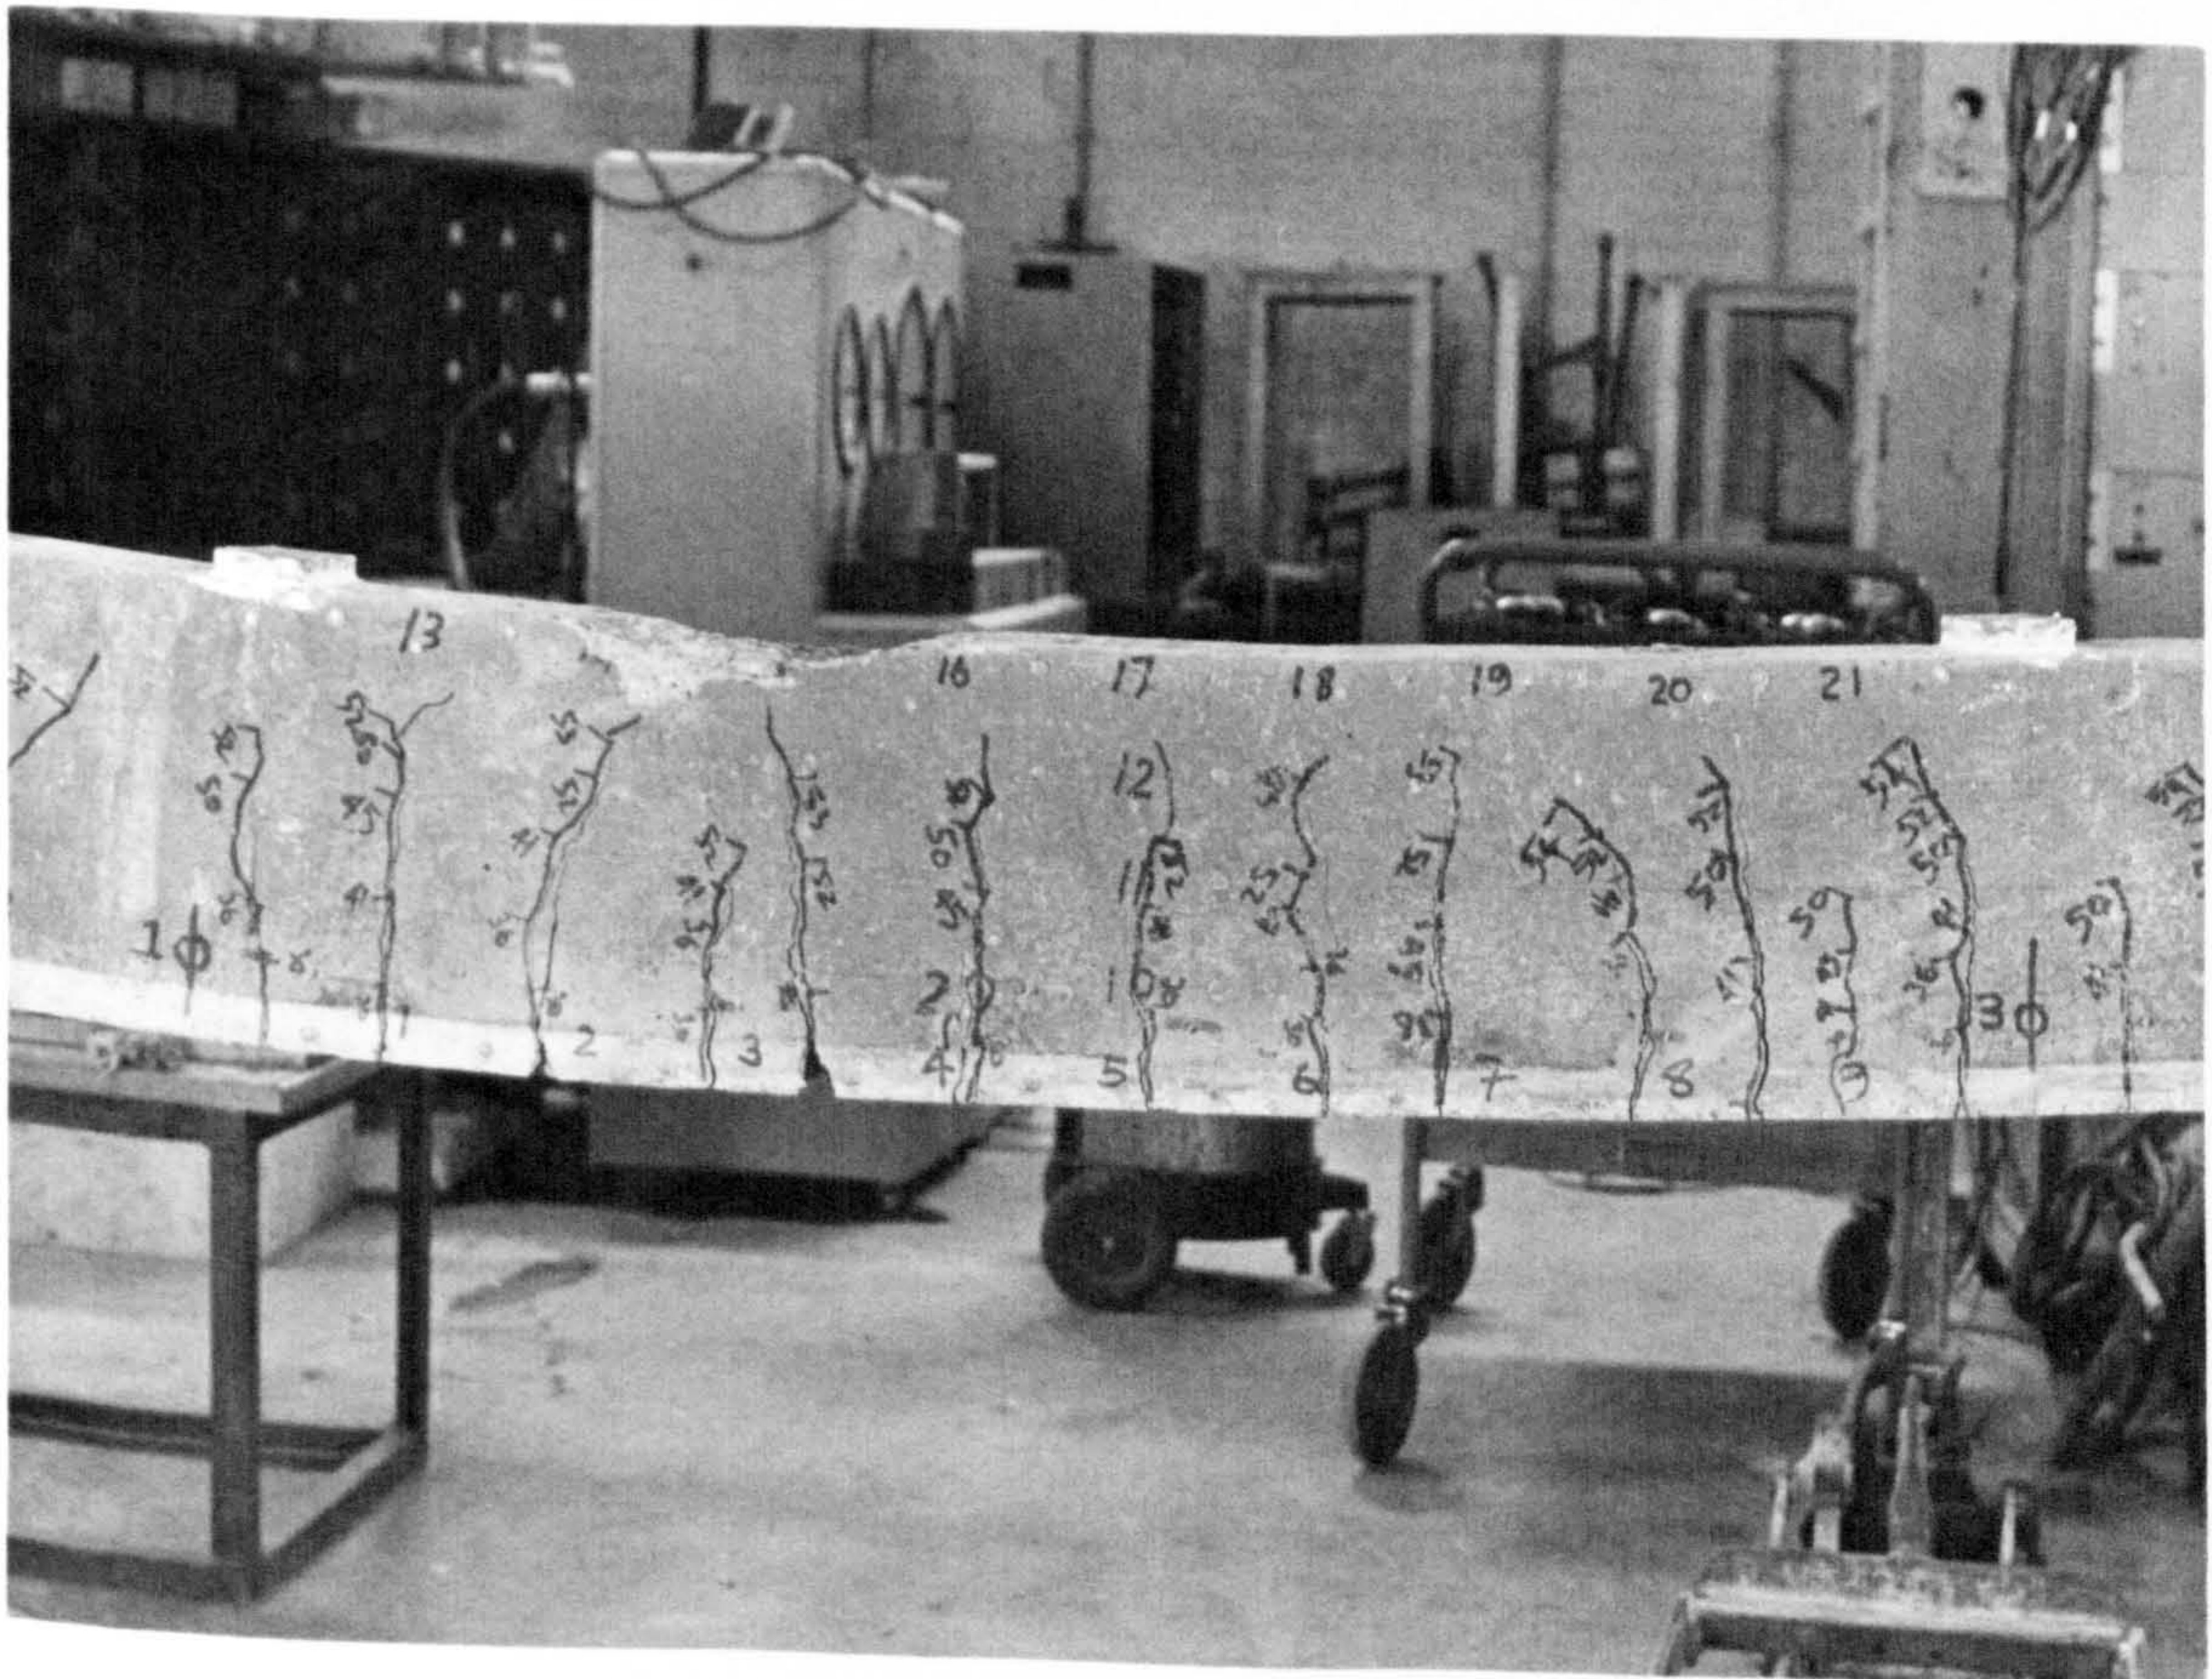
FAILURE CRACK PATTERN ON MODEL 2 LONGITUDINAL SECTION 1
